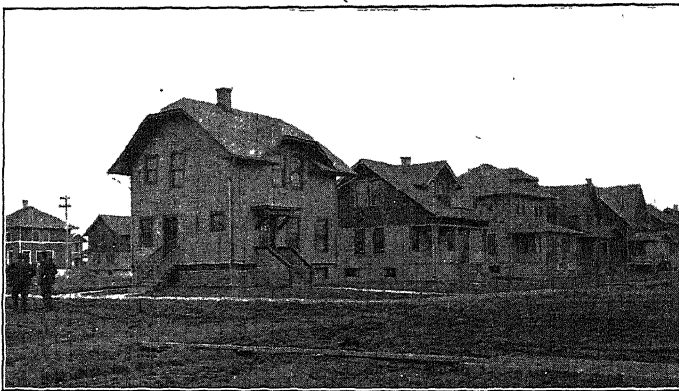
HOUSES AT STANDARD NO. 2 MINE.
